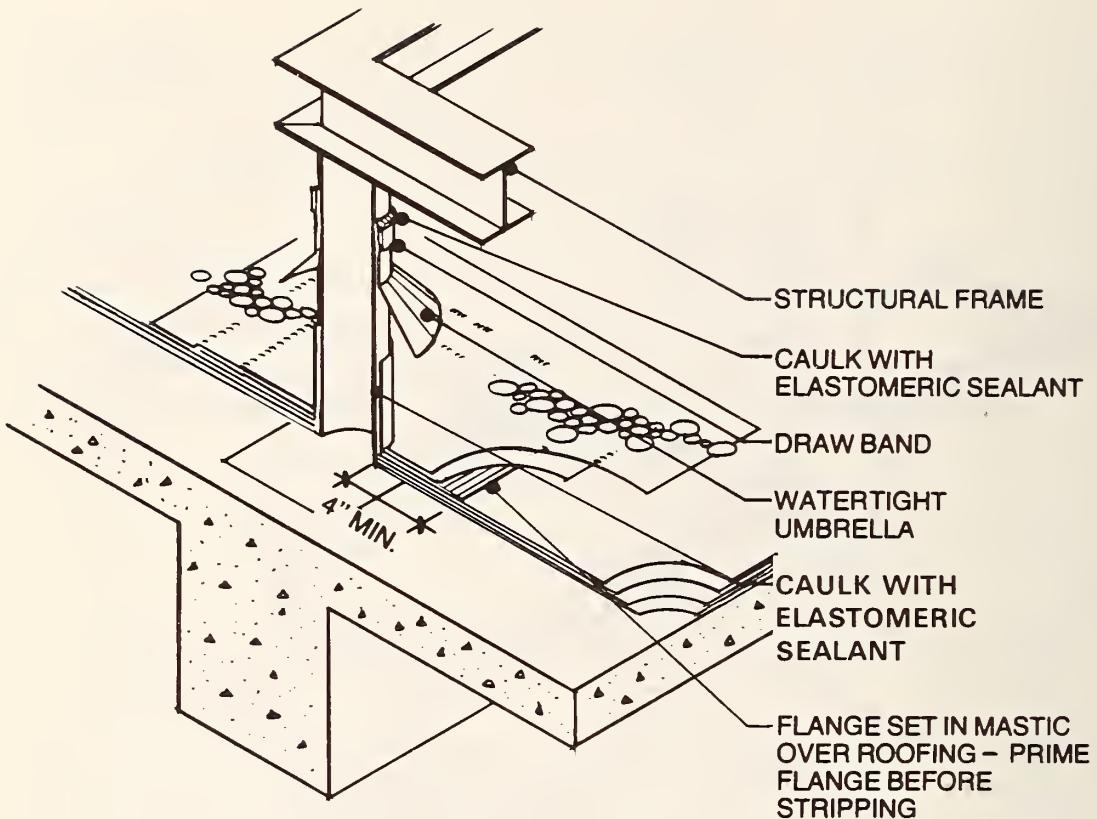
Installation for Mechanical Equipment Stand or Collector Support Frame
